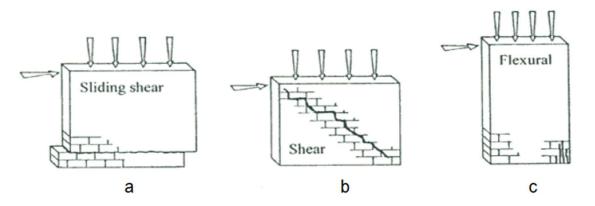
Typical failure modes of unreinforced masonry walls, subjected to in-plane loads: (a) Sliding Shear failure, (b) Shear failure, and (c) Flexural failure (Garbin et al., 2007)
